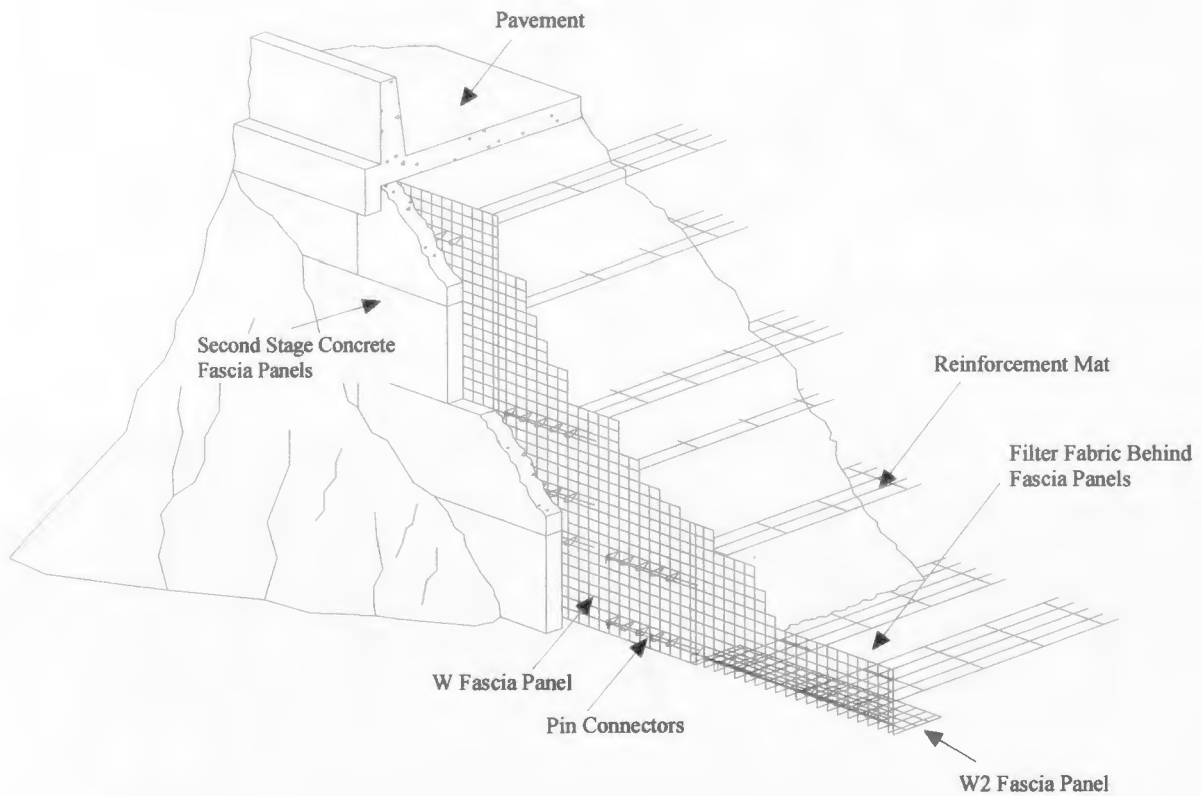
Schematic of a typical MSE wall system used on the I-15 reconstruction project
